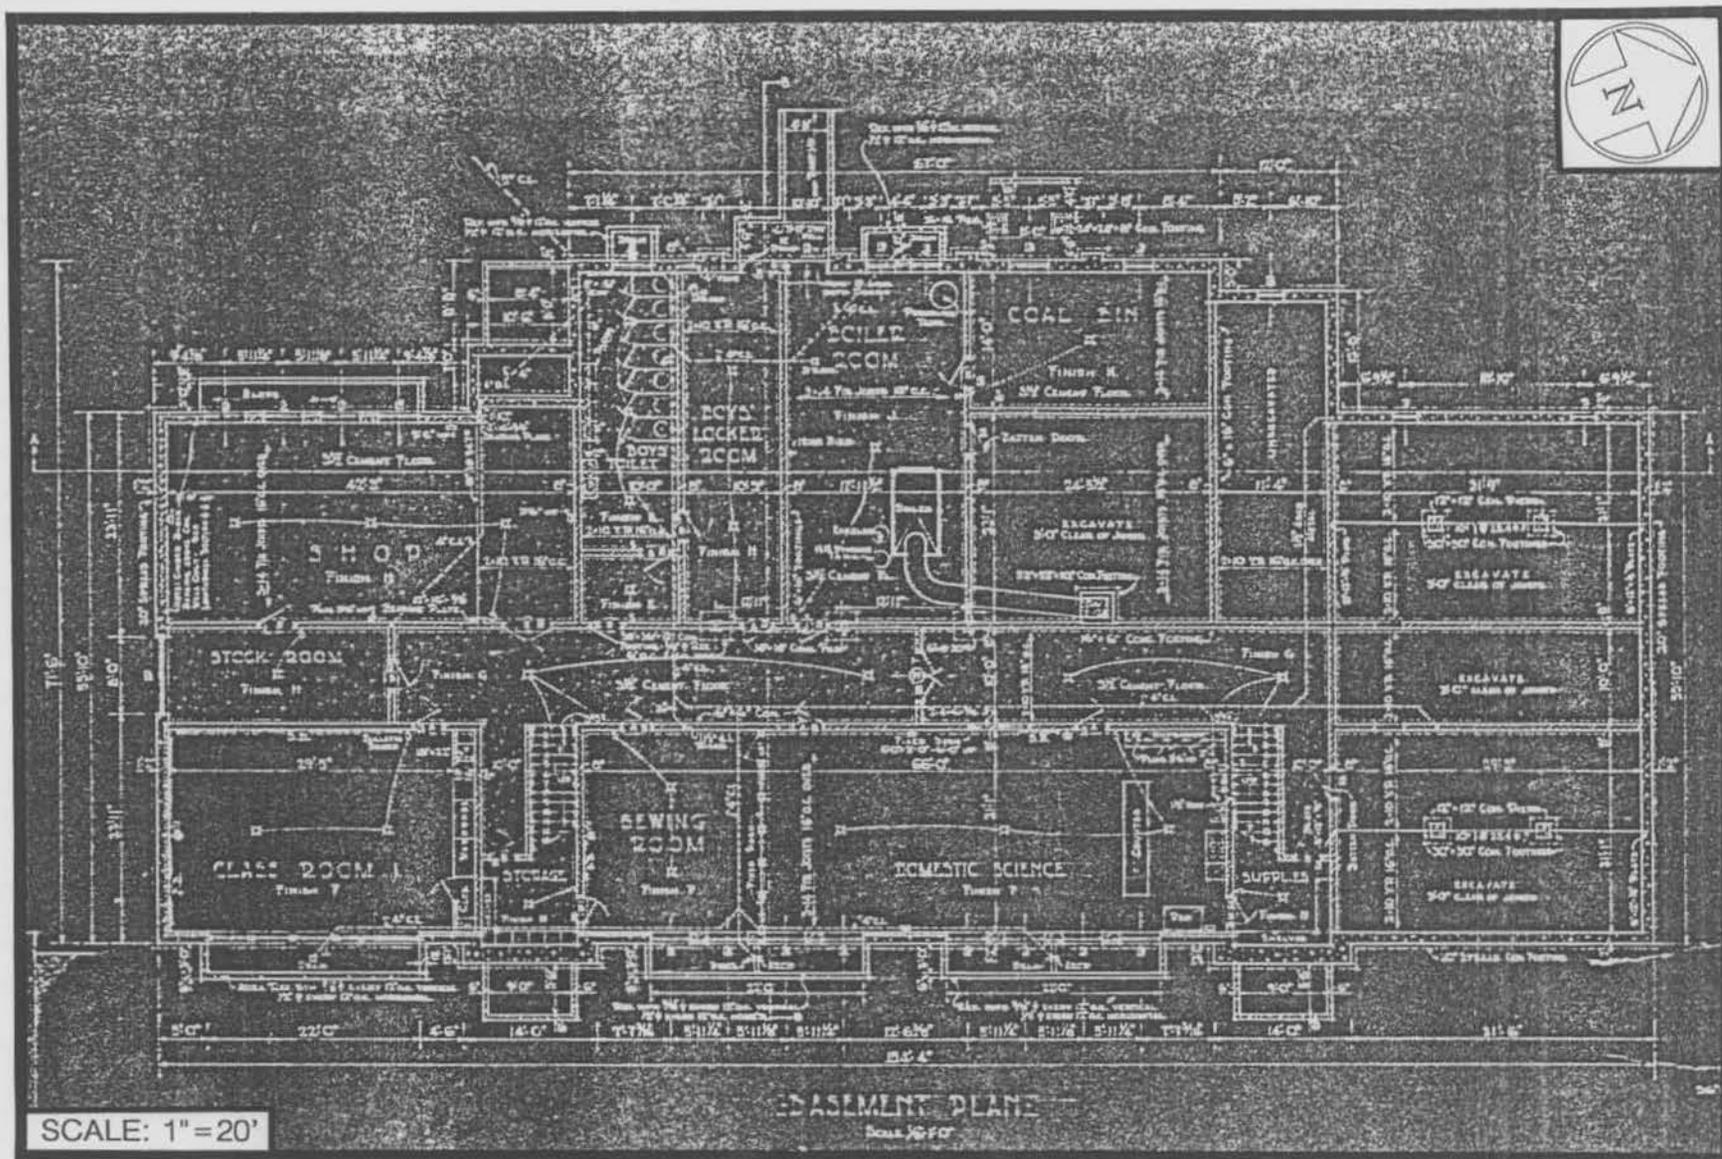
1931 basement floor plan, Elmer Wolfe School
